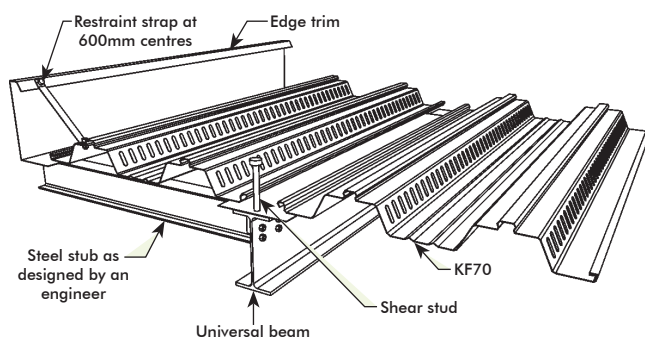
O KF70® Side Cantilever with Stub Bracket
